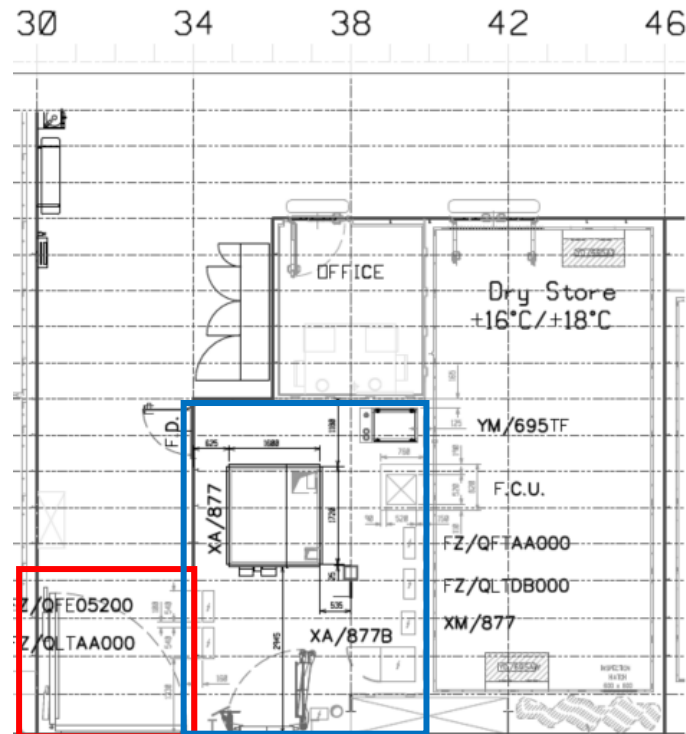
Plan view of the Deck A of the cruise ship, highlighting the boarding bridge (in red) and the new Shore Connection equipment room (in blue)
